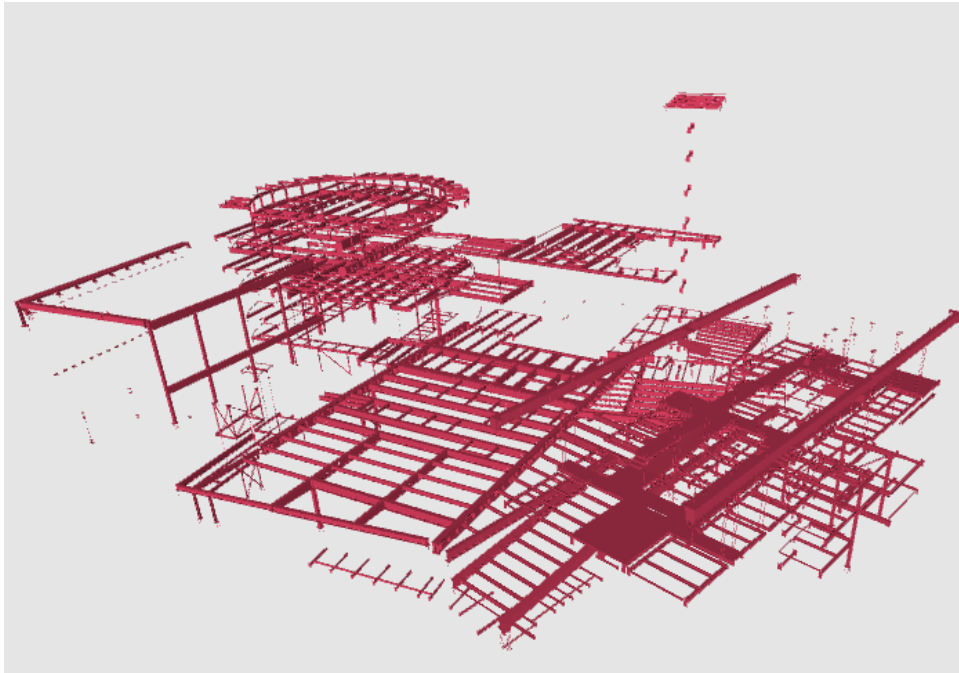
Structural Steel Frame model provided by Turner Construction Company
